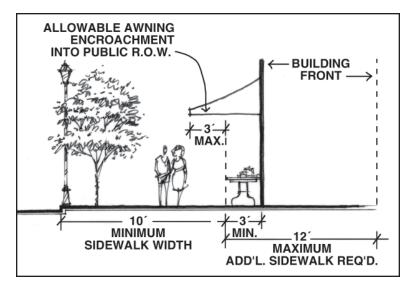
Pedestrian access easements on all streets in the UDO with the exception of Franklin Road which requires a minimum usable sidewalk width of eighteen (18) feet.
